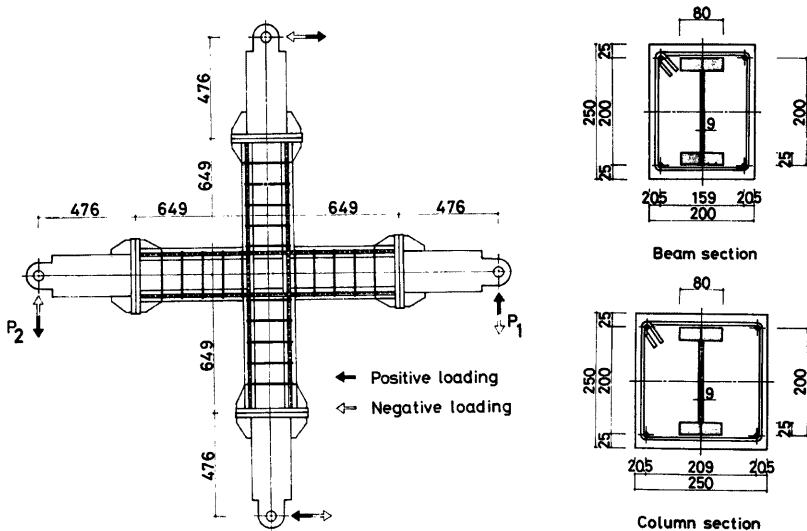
Specimen and cross sections for specimen, I-B8R (units ; mm)
